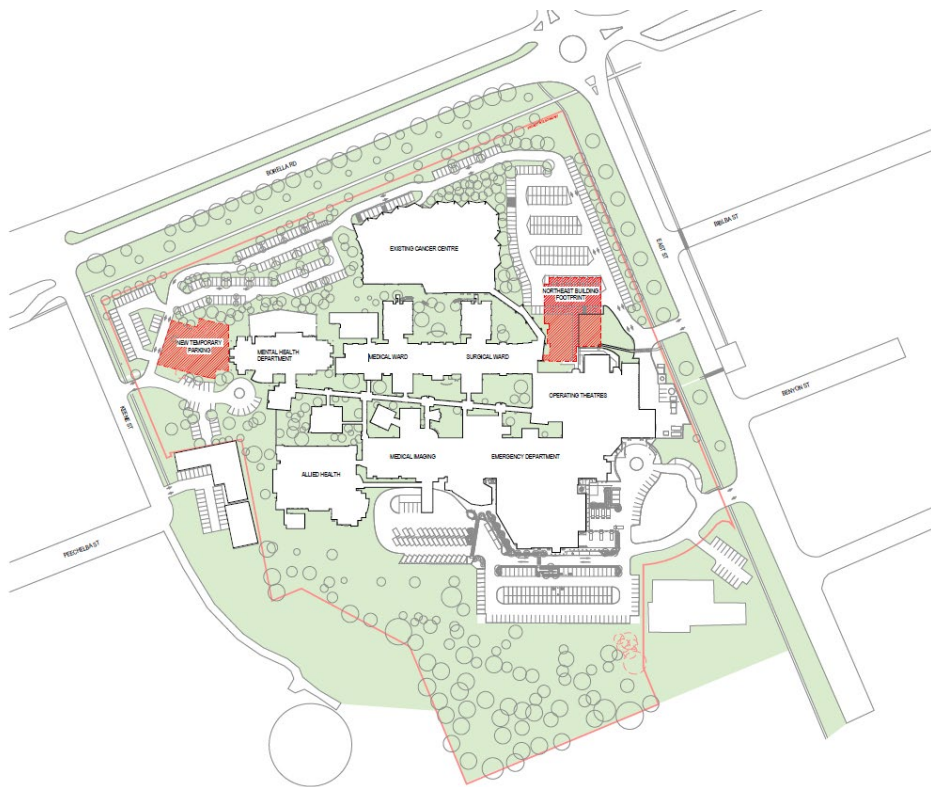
Existing Albury Hospital Site Plan with REF Proposal extent of works
